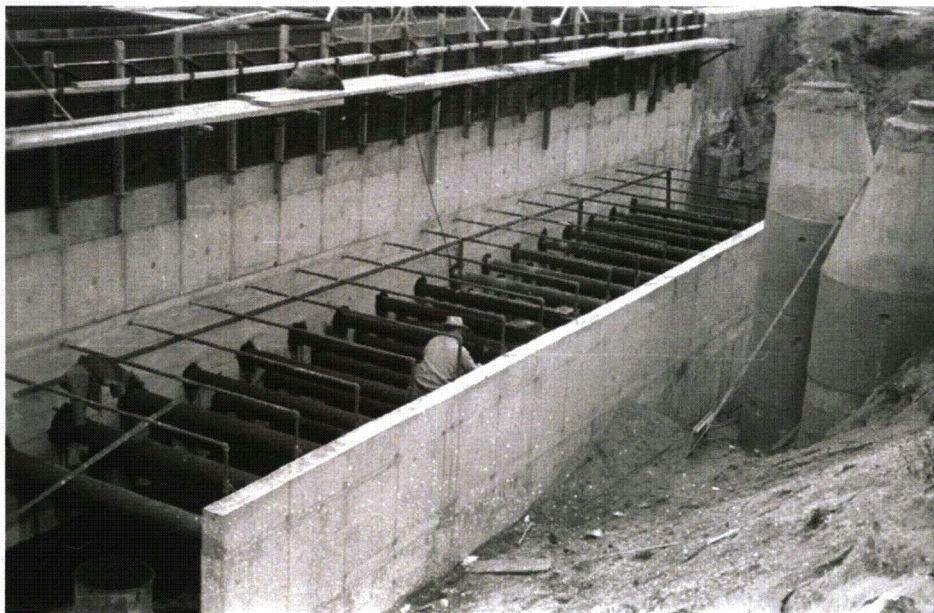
, Storage Ports under Construction – view from NW looking toward SE
